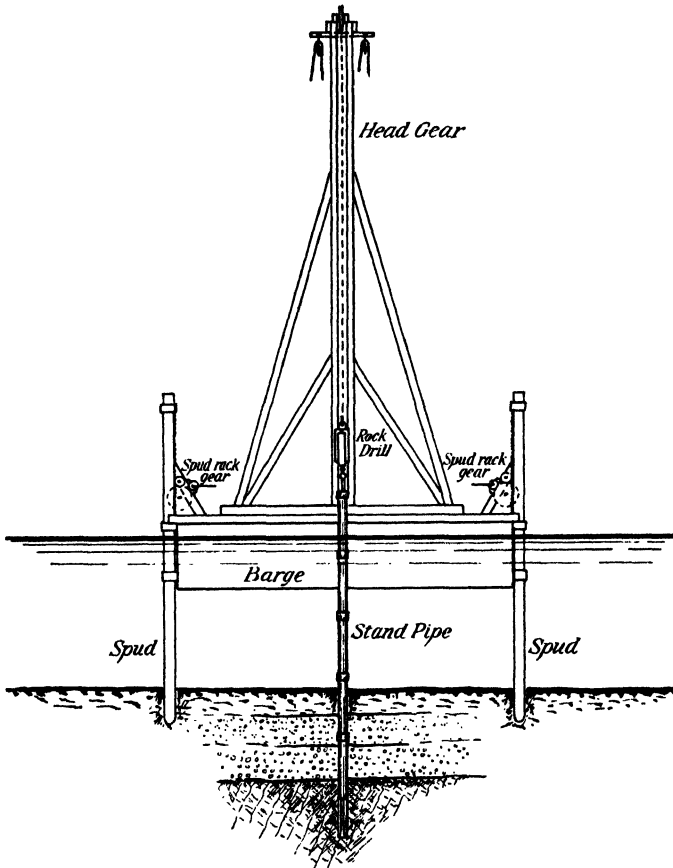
Spud Boring Barge, with Rock Drill, Front Elevation.
